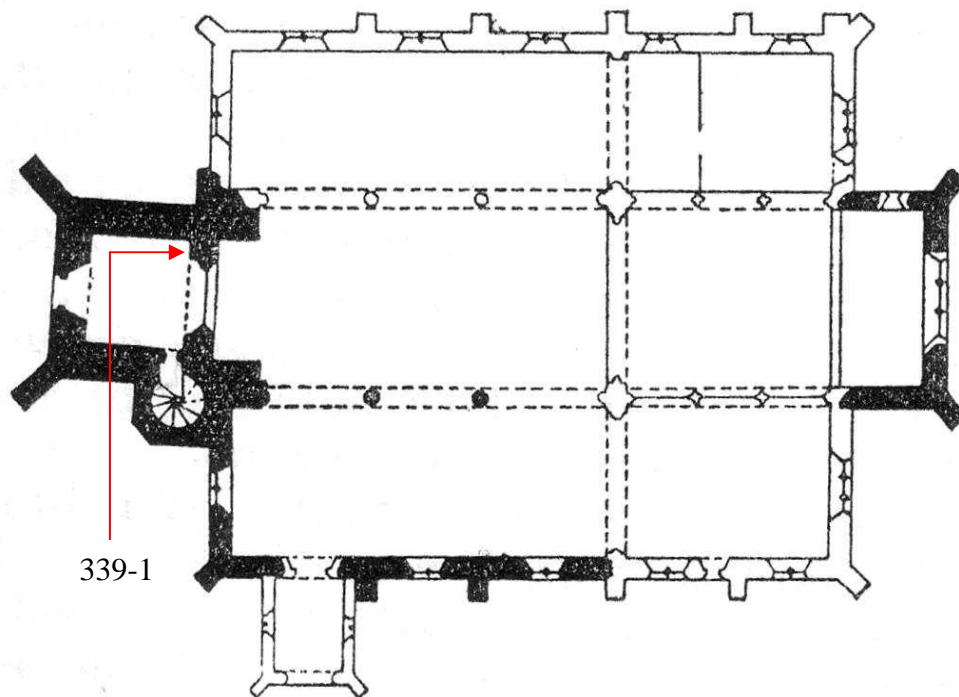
Sampling location in Earls Colne church. Note that this plan only shows the ground floor of the church and that the sample was collected from the second stage of the church tower (RCHM, 1922, 87).
